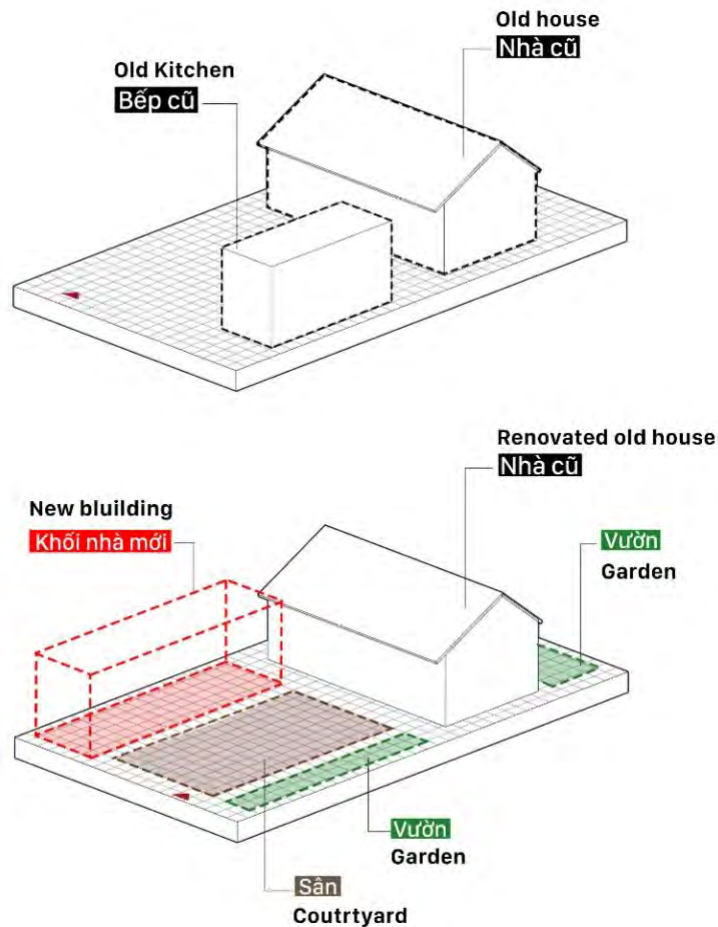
Construction layout ideas in the master plan of Doan Vien house
